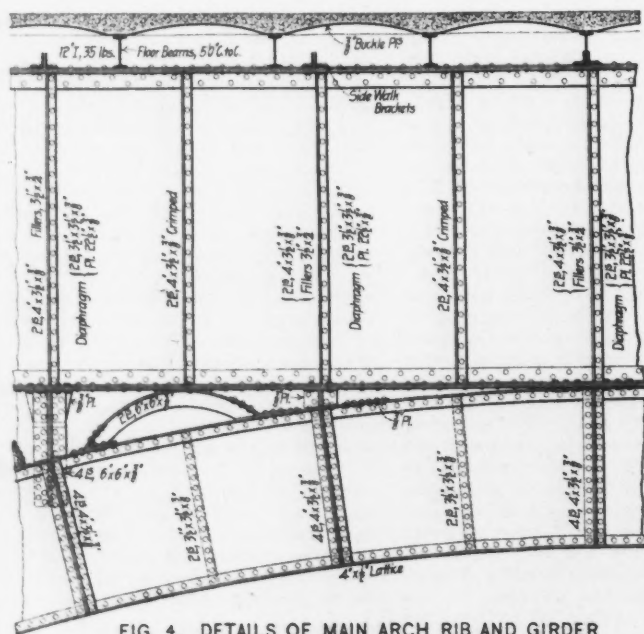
DETAILS OF MAIN ARCH RIB AND GIRDER AT CROWN, 130-FT. SPAN.
